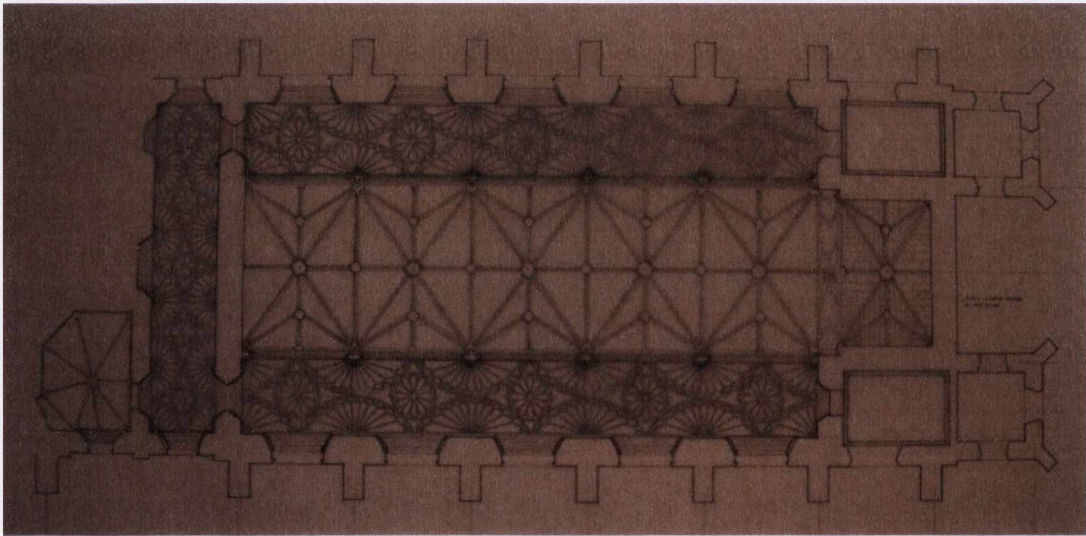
Castle Chapel, Dublin Castle, plan at gallery level showing reflected ceiling plan, OPW drawings, OPW, U16 8, courtesy of Office of Public Works.
